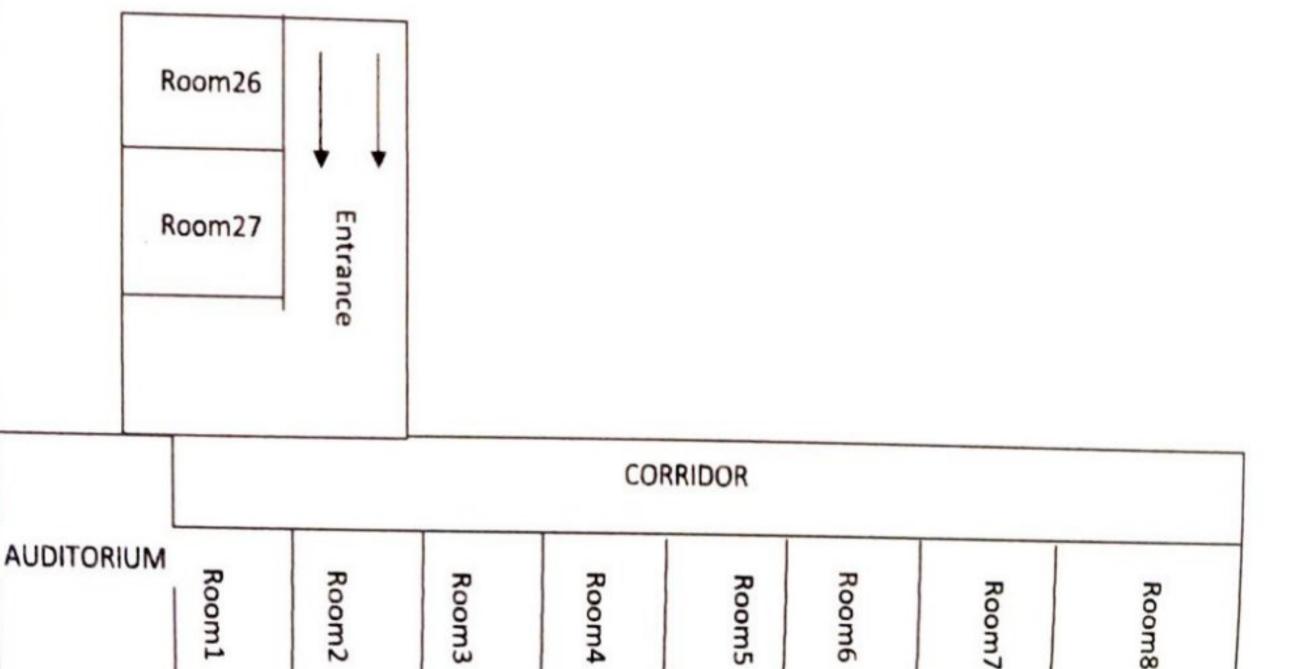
GROUND FLOOR PLAN (Building No.2)
